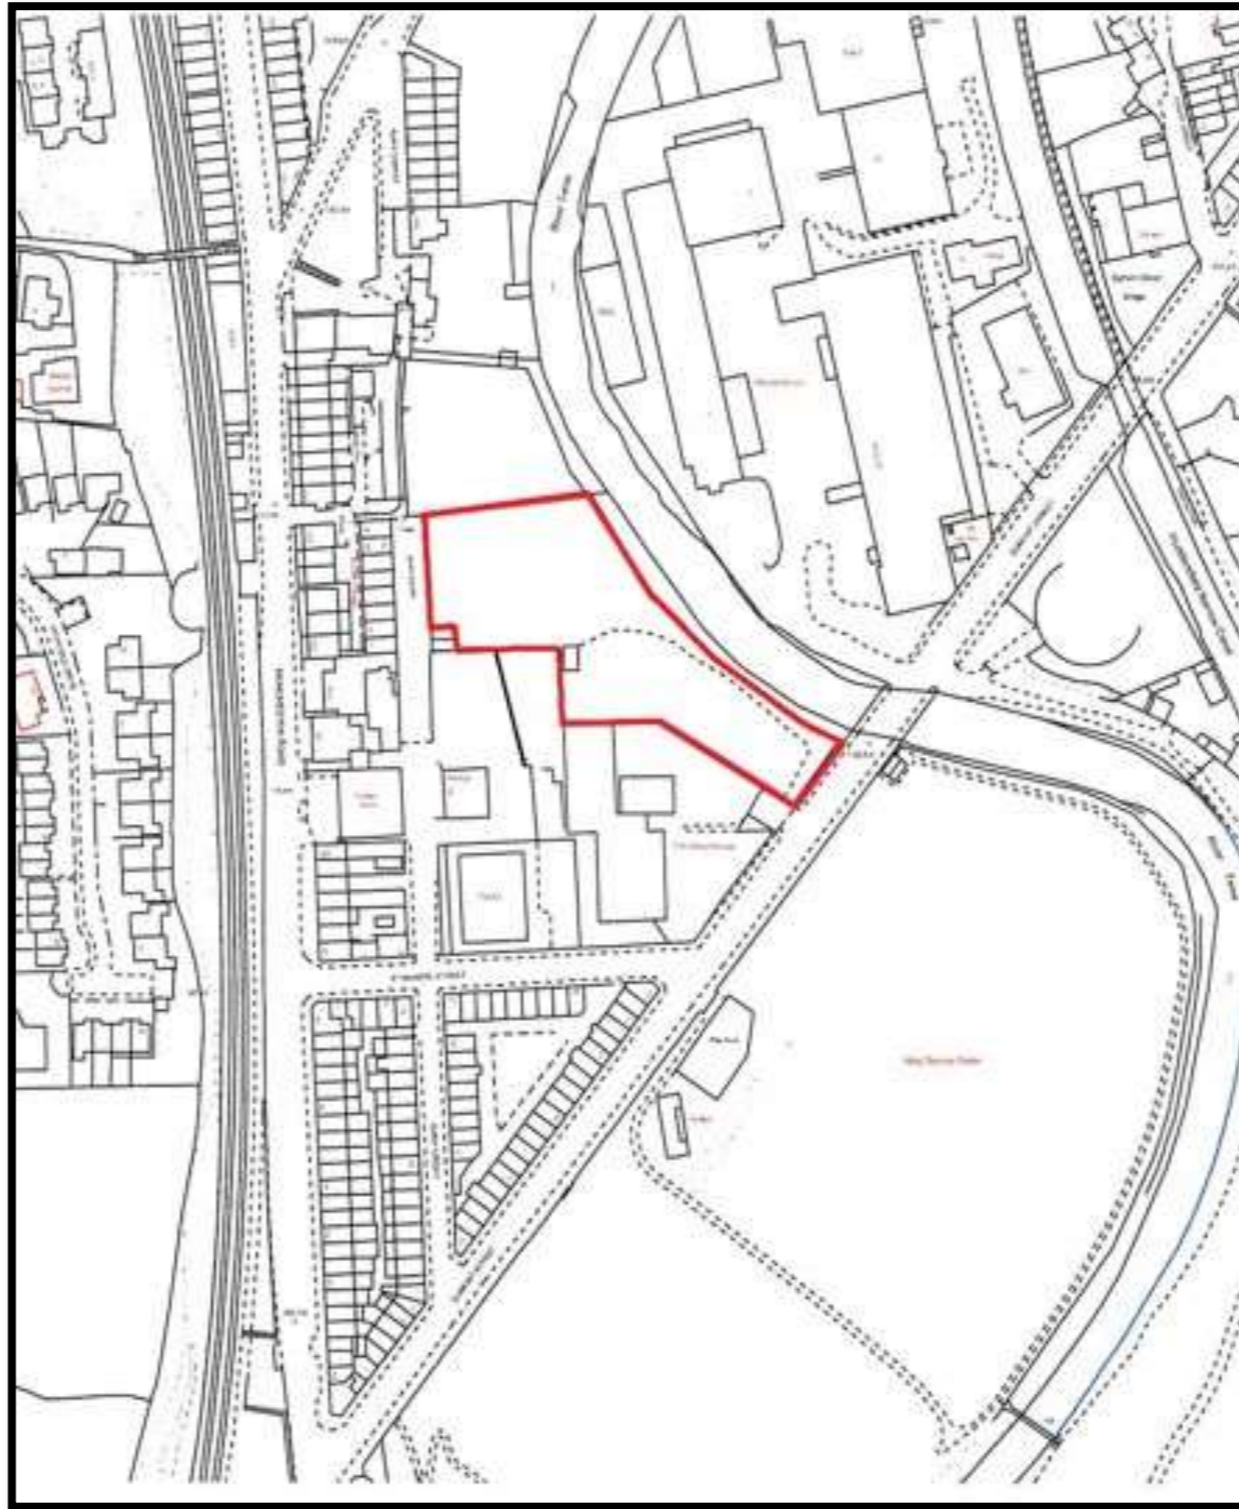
Location Plan, Development Site, Egmont Street, Mossley, OL5 9NB
